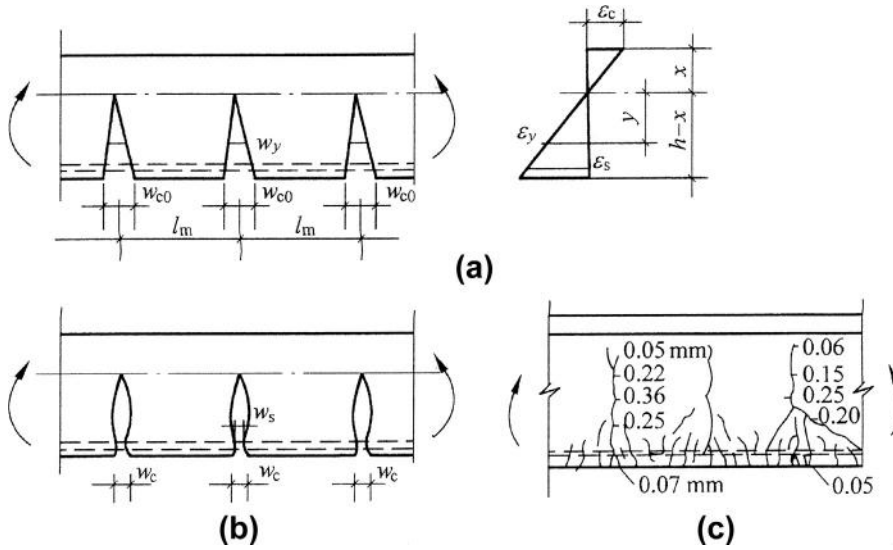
Analysis of crack in a beam: (a) no bond at all ($\tau = 0$), (b) confinement of reinforcement, (c) crack measured in T beam
